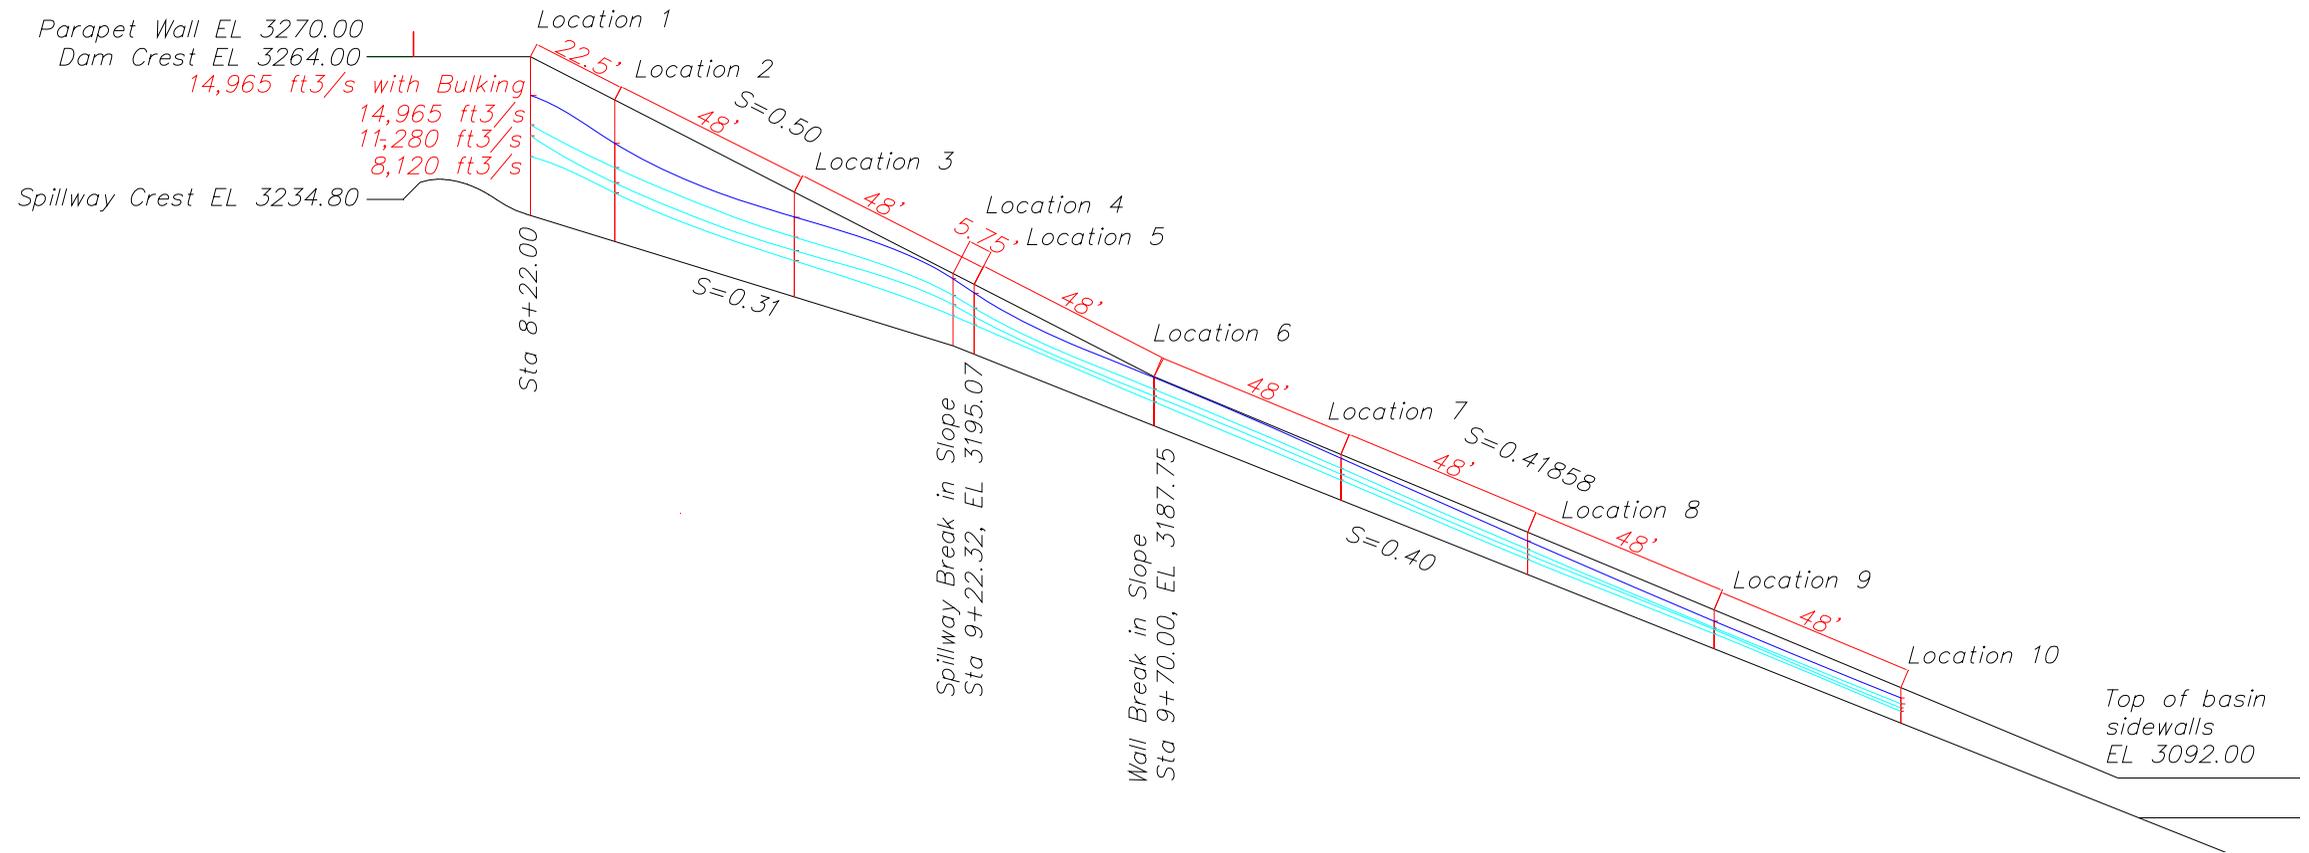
Water surface profiles in the spillway chute for spillway only flow. Estimated bulking was added in for the discharge relating to the top of parapet wall condition at elevation 3270 ft.
